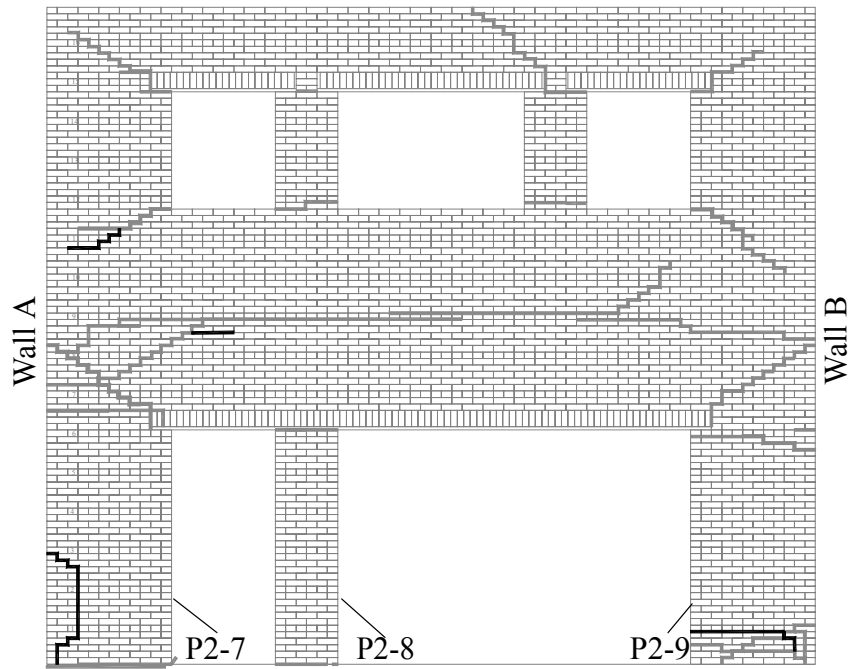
Crack pattern in Wall 2 following Test Run 39.
